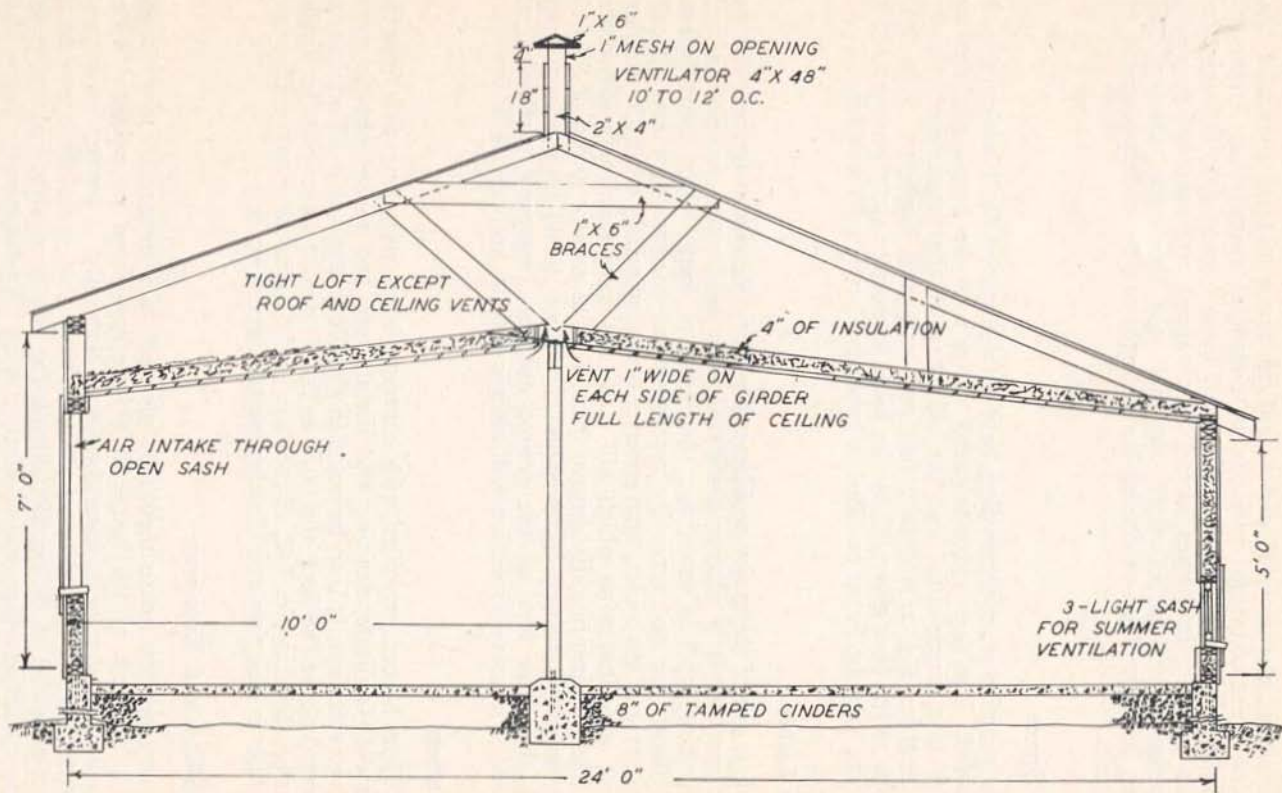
Framing section of gable ceiling insulated laying house showing alternate plan of ventilation incorporating the continuous ceiling vent throughout the length of the building.
